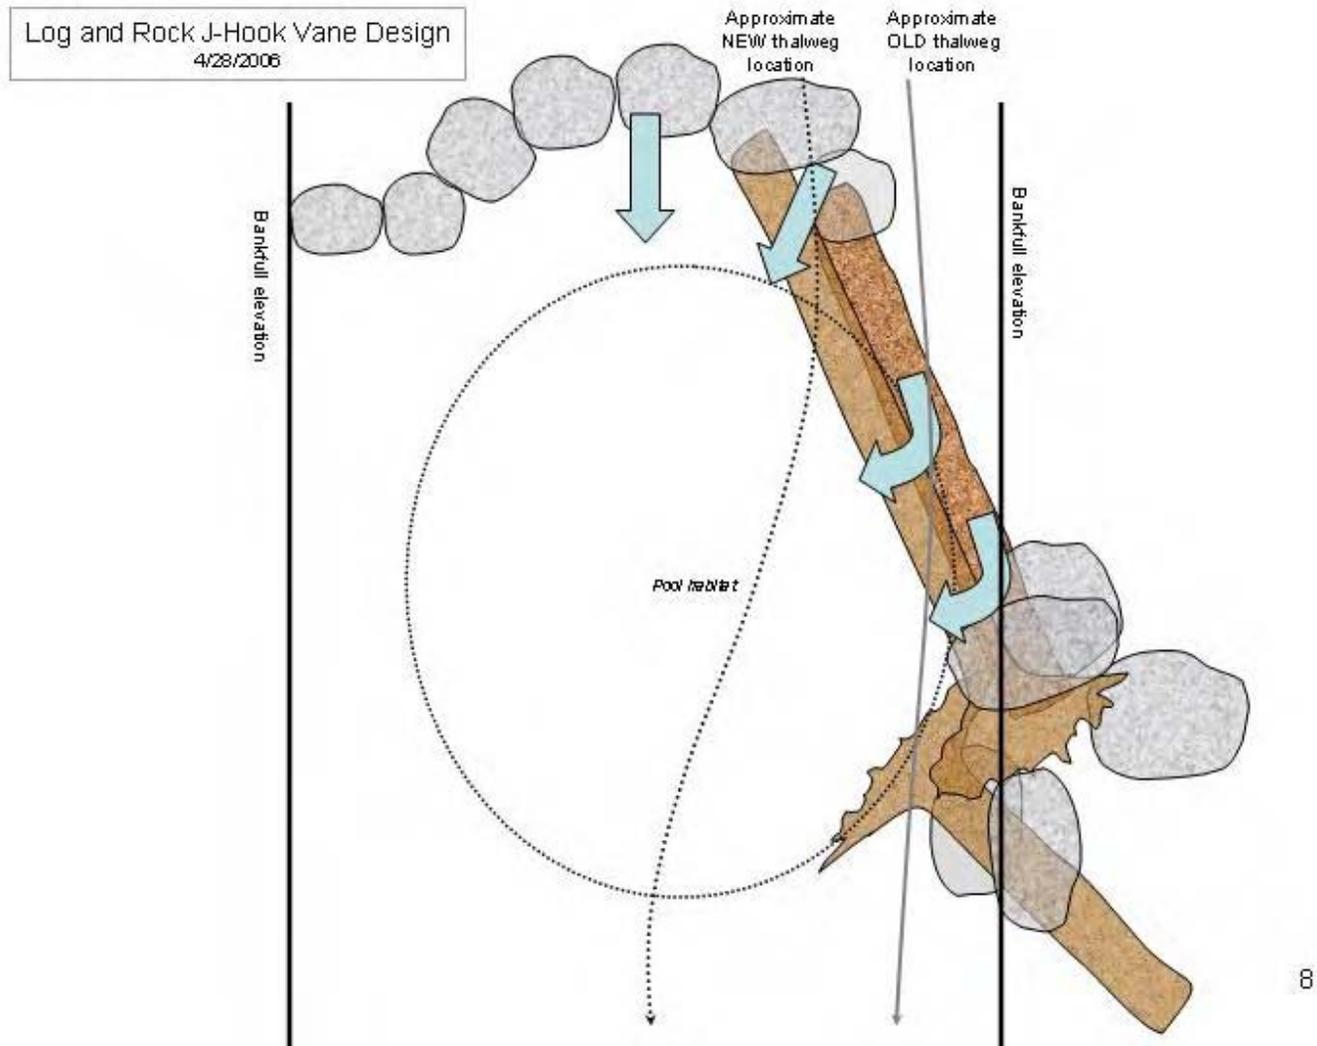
Typical Log and Rock J-Hook Vane Design with Fill
